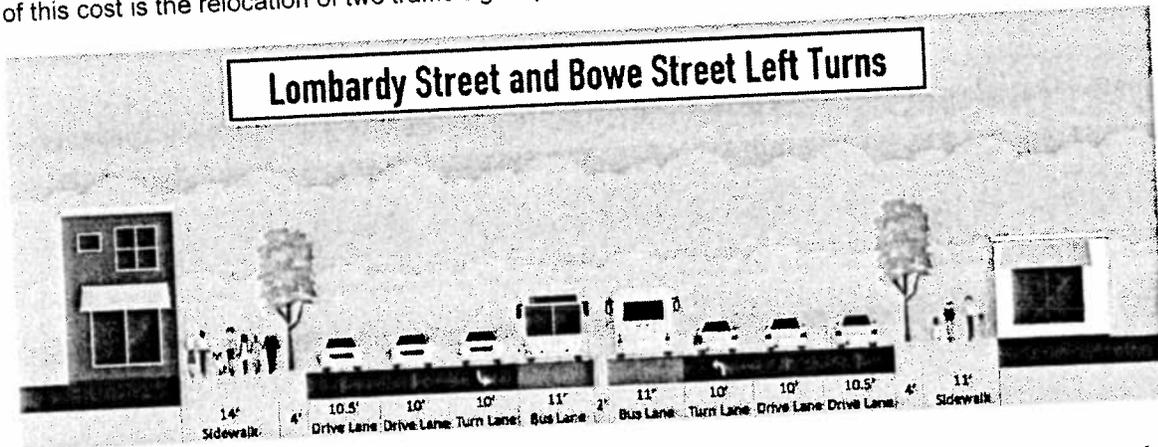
The cross-section of Broad Street at Lombardy Street if an exclusive left-turn lane is installed. Note lanes are at minimum require widths and sidewalk space must be acquired on one side of the roadway.
